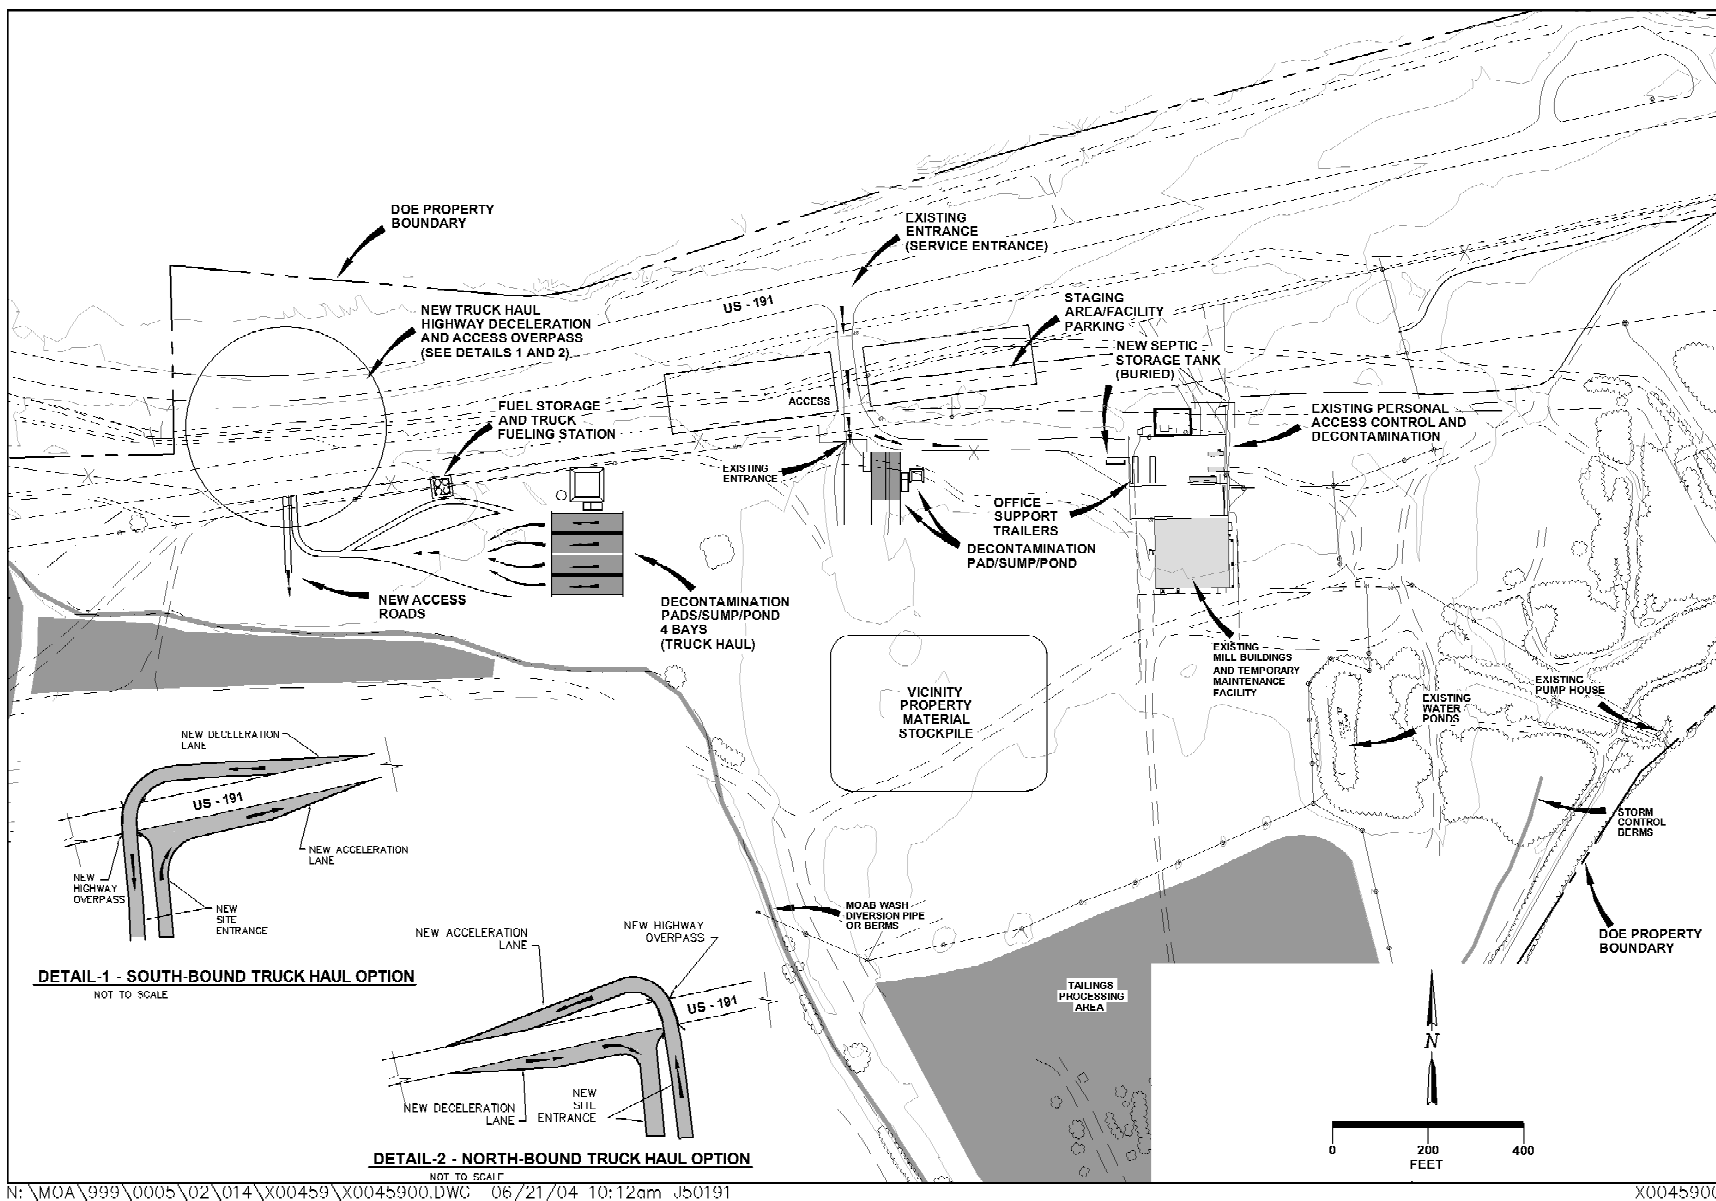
shows the Moab site and anticipated temporary construction infrastructure that would be required to support a truck haul. New highway access, overpass, and acceleration/deceleration lanes would be constructed for the north haul to Klondike Flats or Crescent Junction or south haul to White Mesa Mill. A new site entrance on US-191 would be built approximately halfway between the existing site entrance and Potash Road (SR-279) on the north side of the Moab site. As seen in Figure 2–17, the proposed new truck transportation infrastructure would be located within the Moab site boundary and therefore would not constitute additional land disturbance beyond the 439-acre site area assumed to be disturbed during surface remediation.
